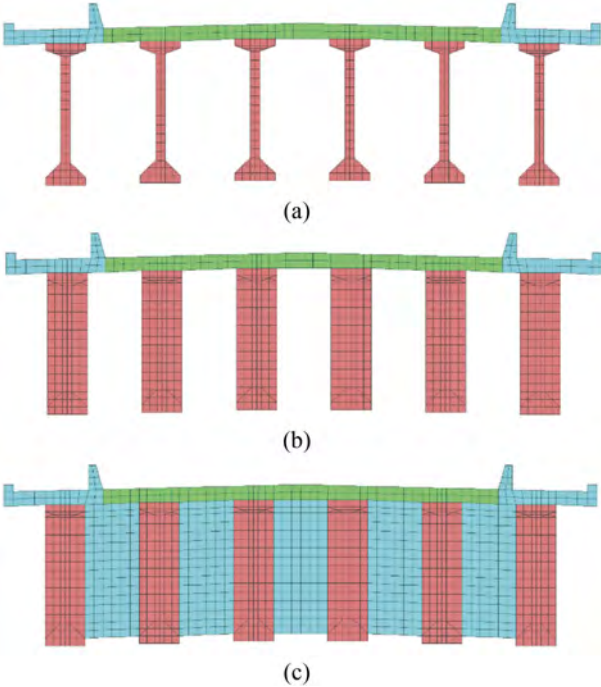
Transversal cross-sectional modeling and finite element discretization of the deck with (a) longitudinal beams, (b) end ribs, and (c) stiffening transversal beams with collaborating top slab.
